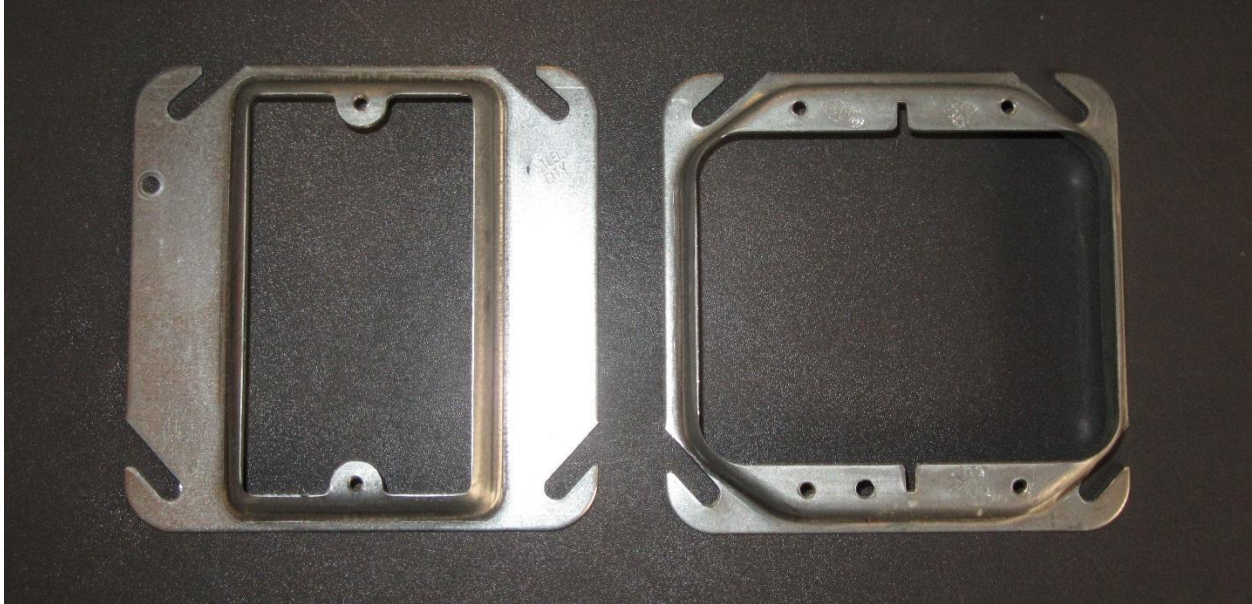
Single (Left) and Two (Right) Device Mounting Rings for New Style 4x4 Boxes
